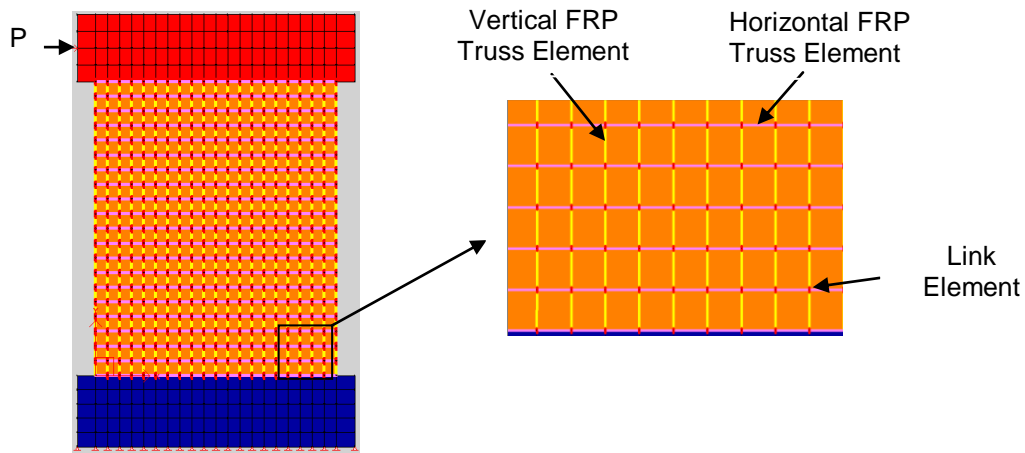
Finite Element Model of Slender FRP Wall Specimen & Components.
